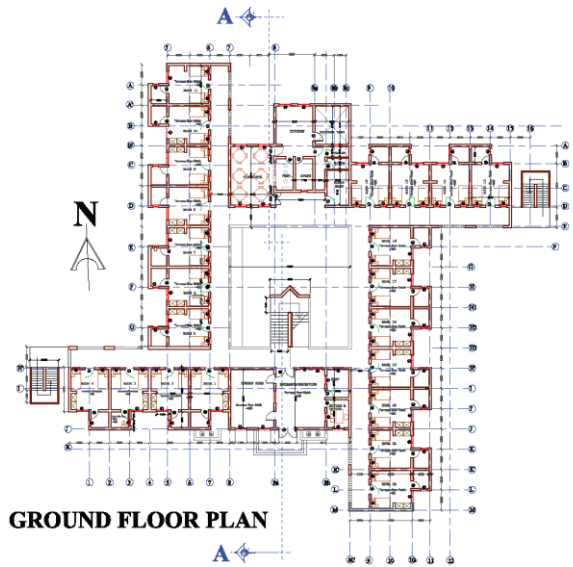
Ground floor plan: Female Hostel KASU main campus (Source: KASU, Physical Planning department's archive)
